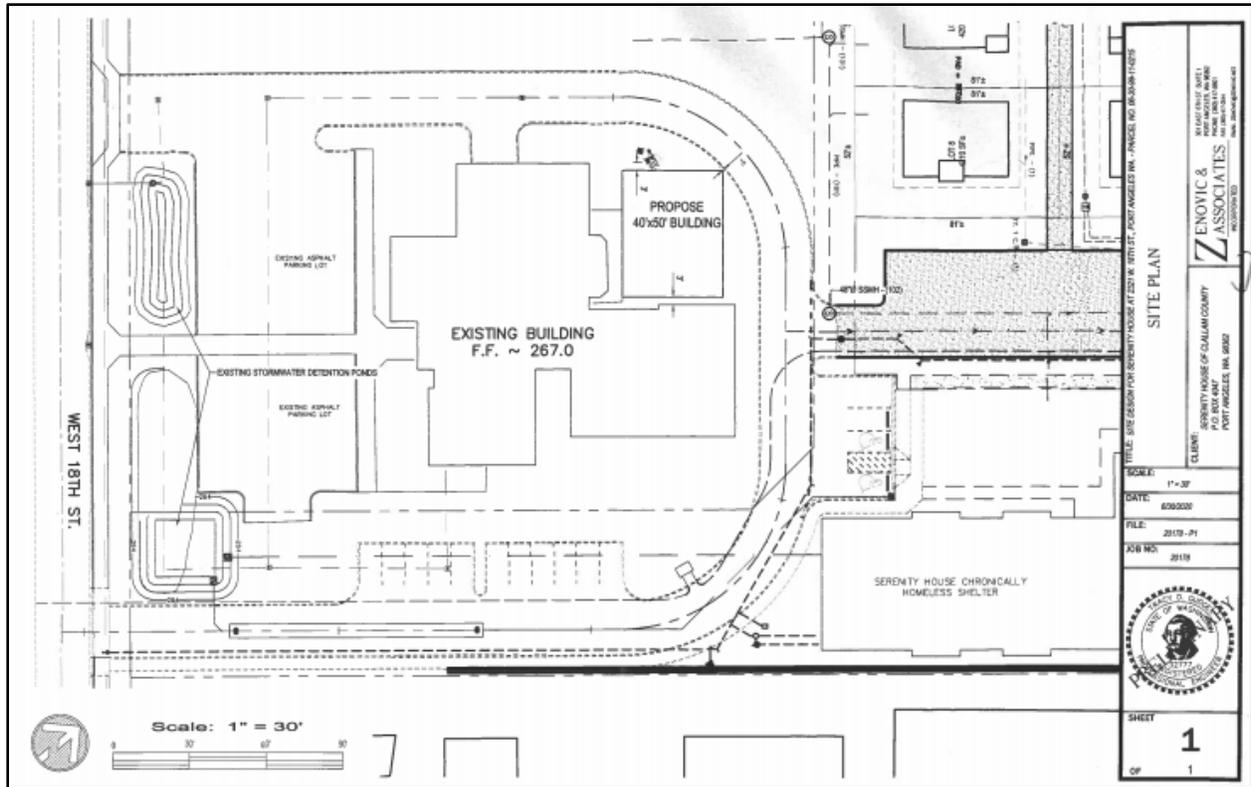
The site plan is an excerpt of Exhibit 2. See Figure 3 in this staff report for a site plan identifying parking and tent camping locations.
